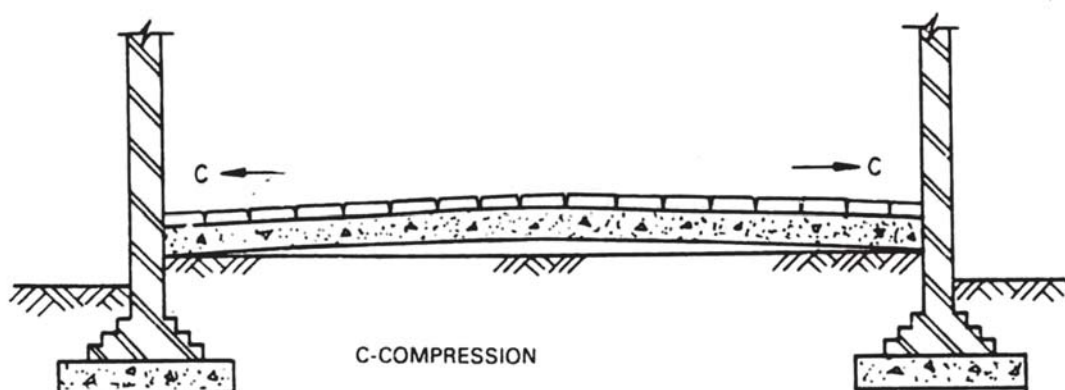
Cracking and Upheaving of a Tile Floor due to Sulphur Action in Base Concrete (Ref : SP25 (S&T) 1984)
